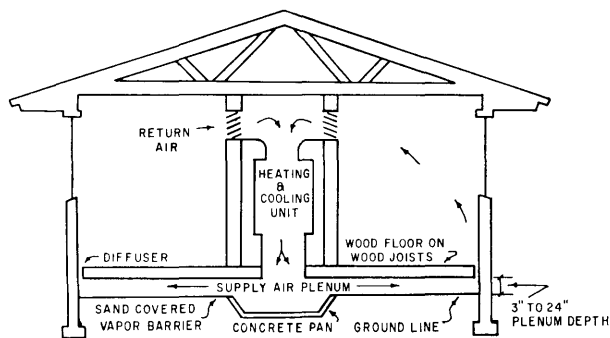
Sketch of a wood floor system with ductless, underfloor-plenum air distribution for heating and cooling single-family houses.
